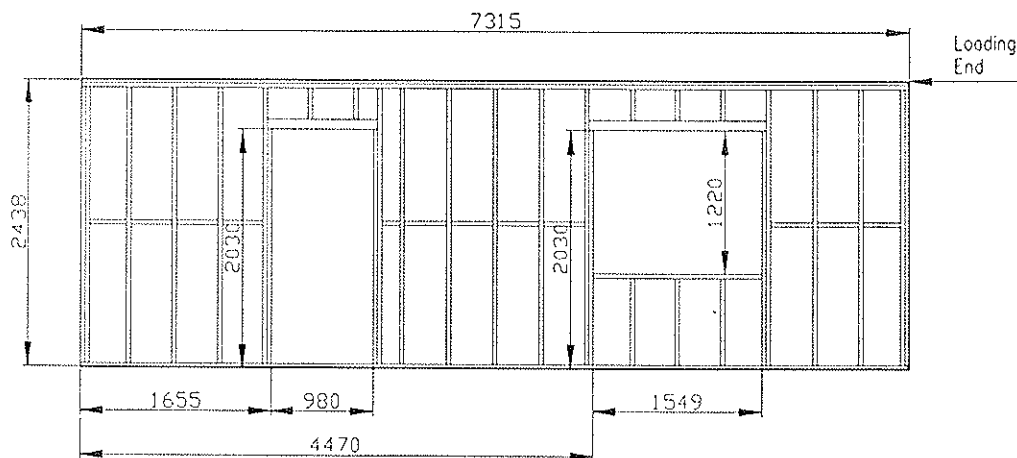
Shear Wall Layout Showing Locations and Dimensions of Door and Window
